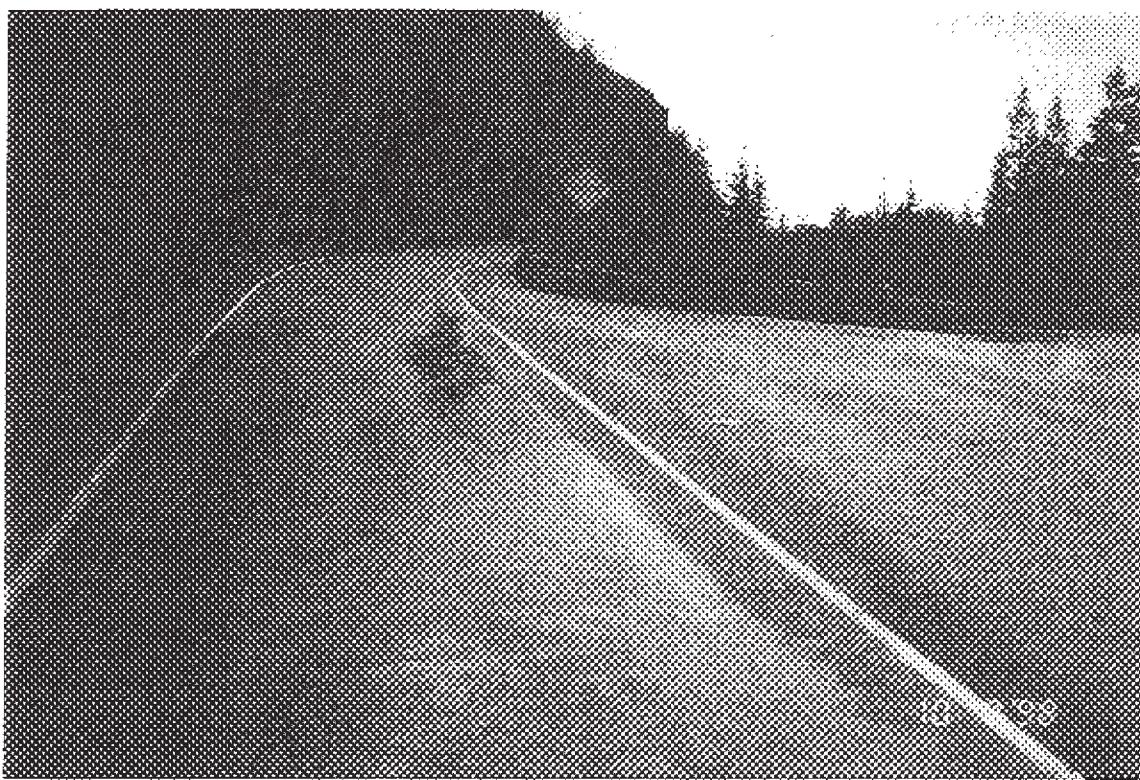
MP 0.08 - Rock wall, typical pavement section
